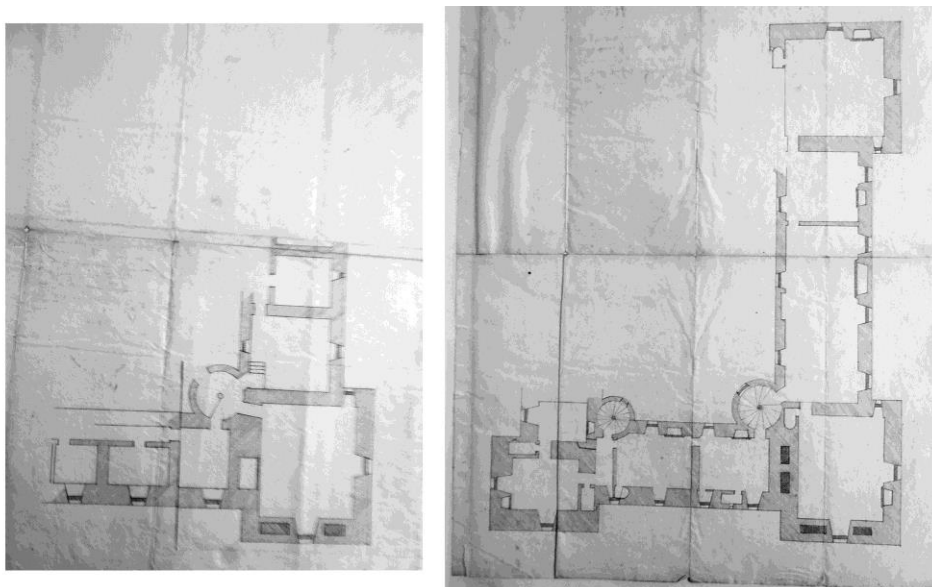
Ground and Third floor Plan '*as reformed*' dated 1618, showing the existing NW and the new SW and SE towers (Drumlanrig Castle Archive)
